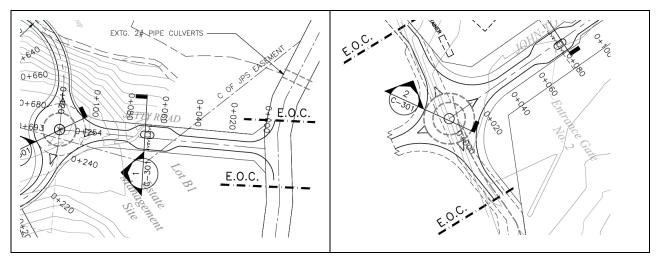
Entrances to the Sub-Division: a) Jetty Road off Robin's Bay main road and b) John-to Whit Road off Tower Road.
